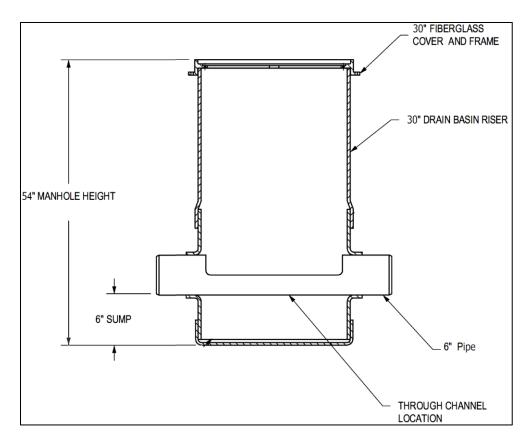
Monitoring manhole cross-section. Image source: Section drawings provided by ADS-Pipe shop drawings
